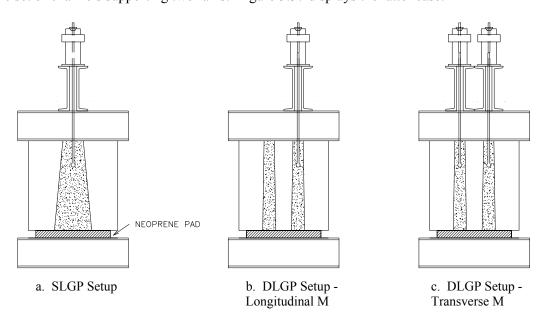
Ram Configuration for Single-Line & Double-Line Grout Pocket Tests [3.1]
